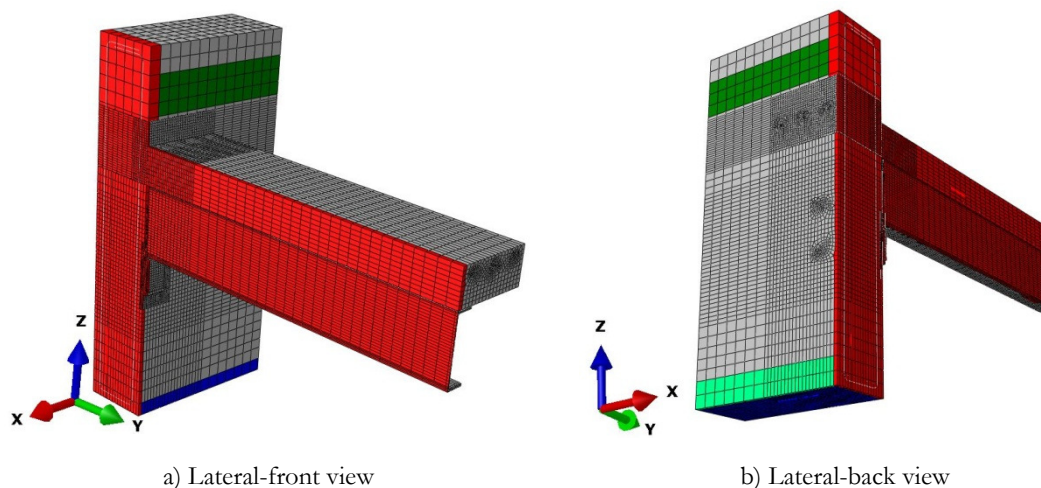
Finite element idealization of the composite beam to reinforced concrete wall joint tested within (Kuhlmann *et al.*, 2012)
